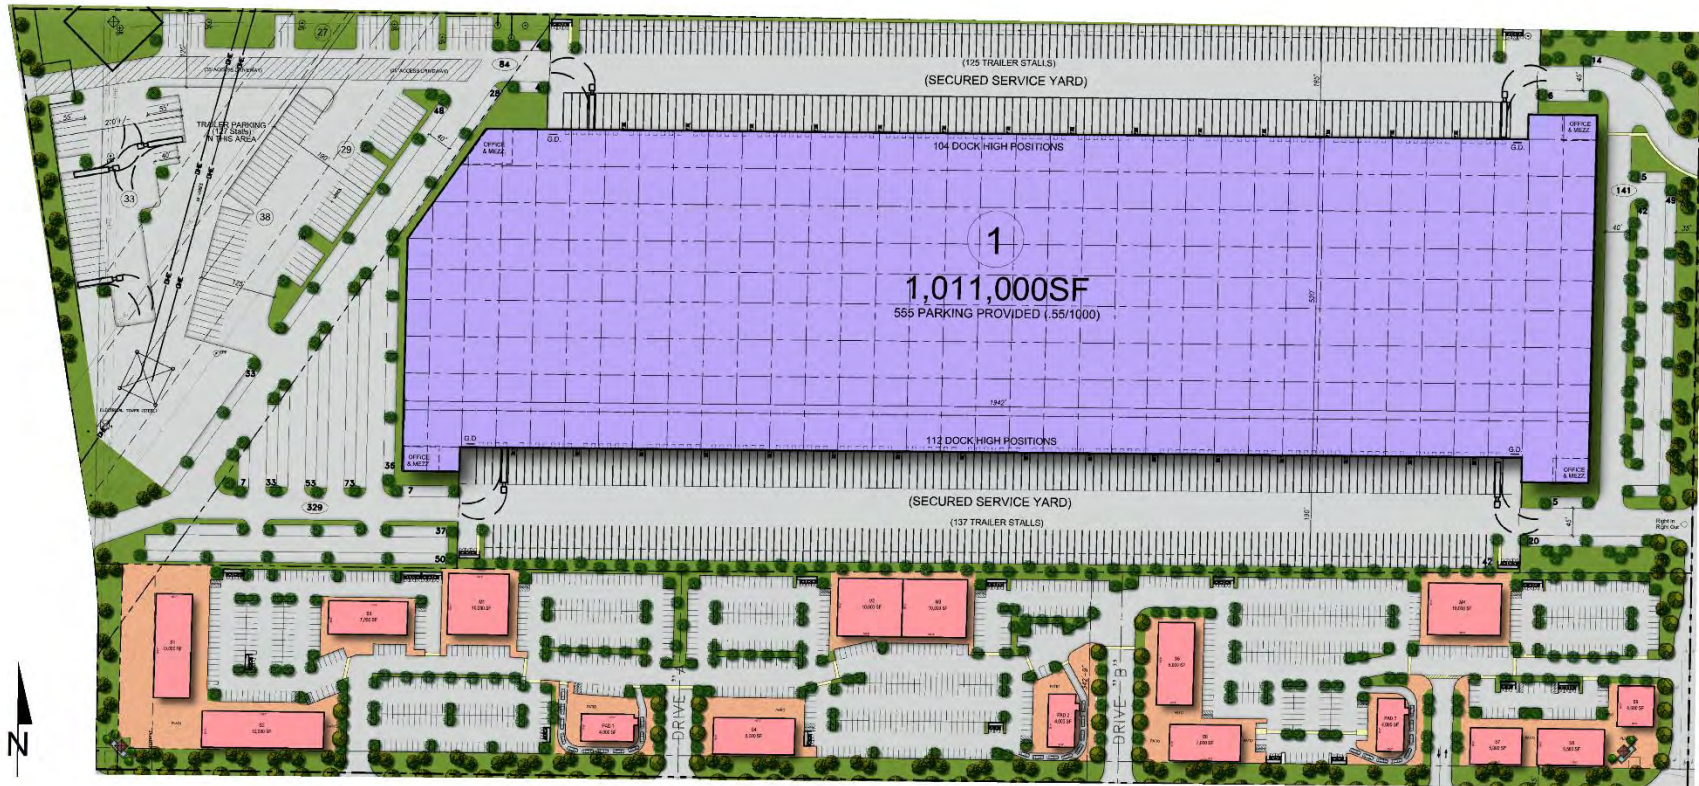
B: CONCEPTUAL SITE PLAN (PA 7)
